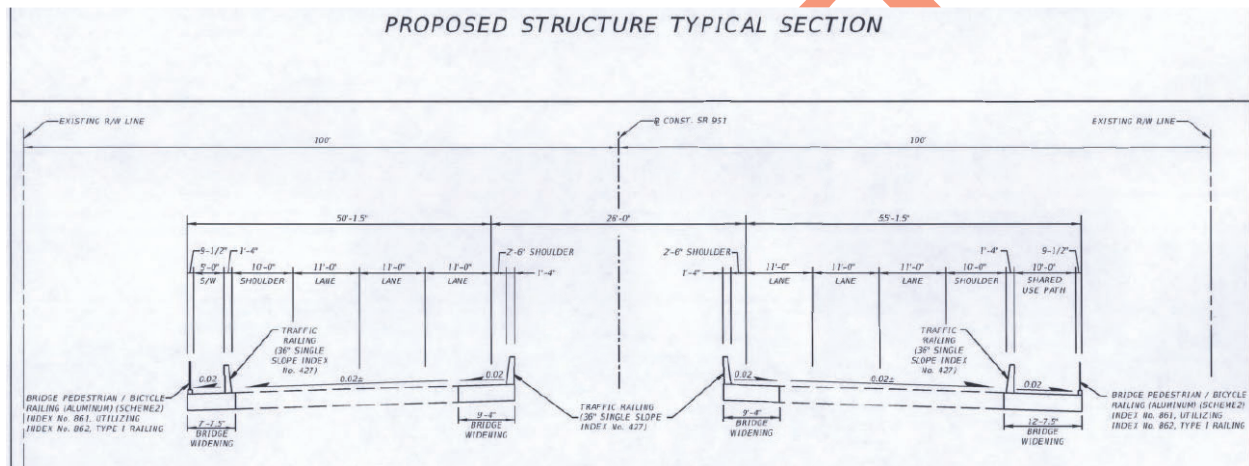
Proposed Typical Section for the Henderson Creek Bridge (FPID 435111-2)
